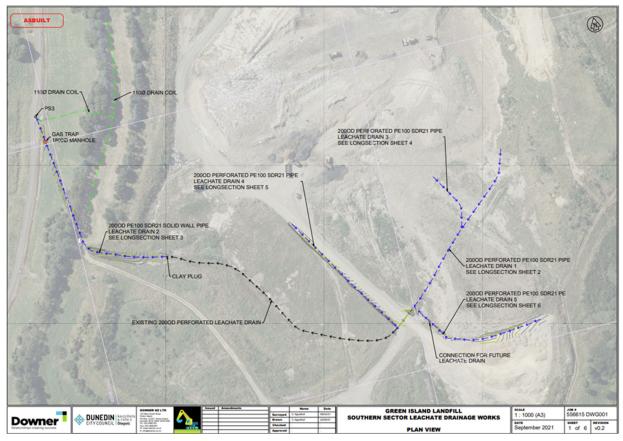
Asbuilt for horizontal leachate collection drain and connection to PS3
